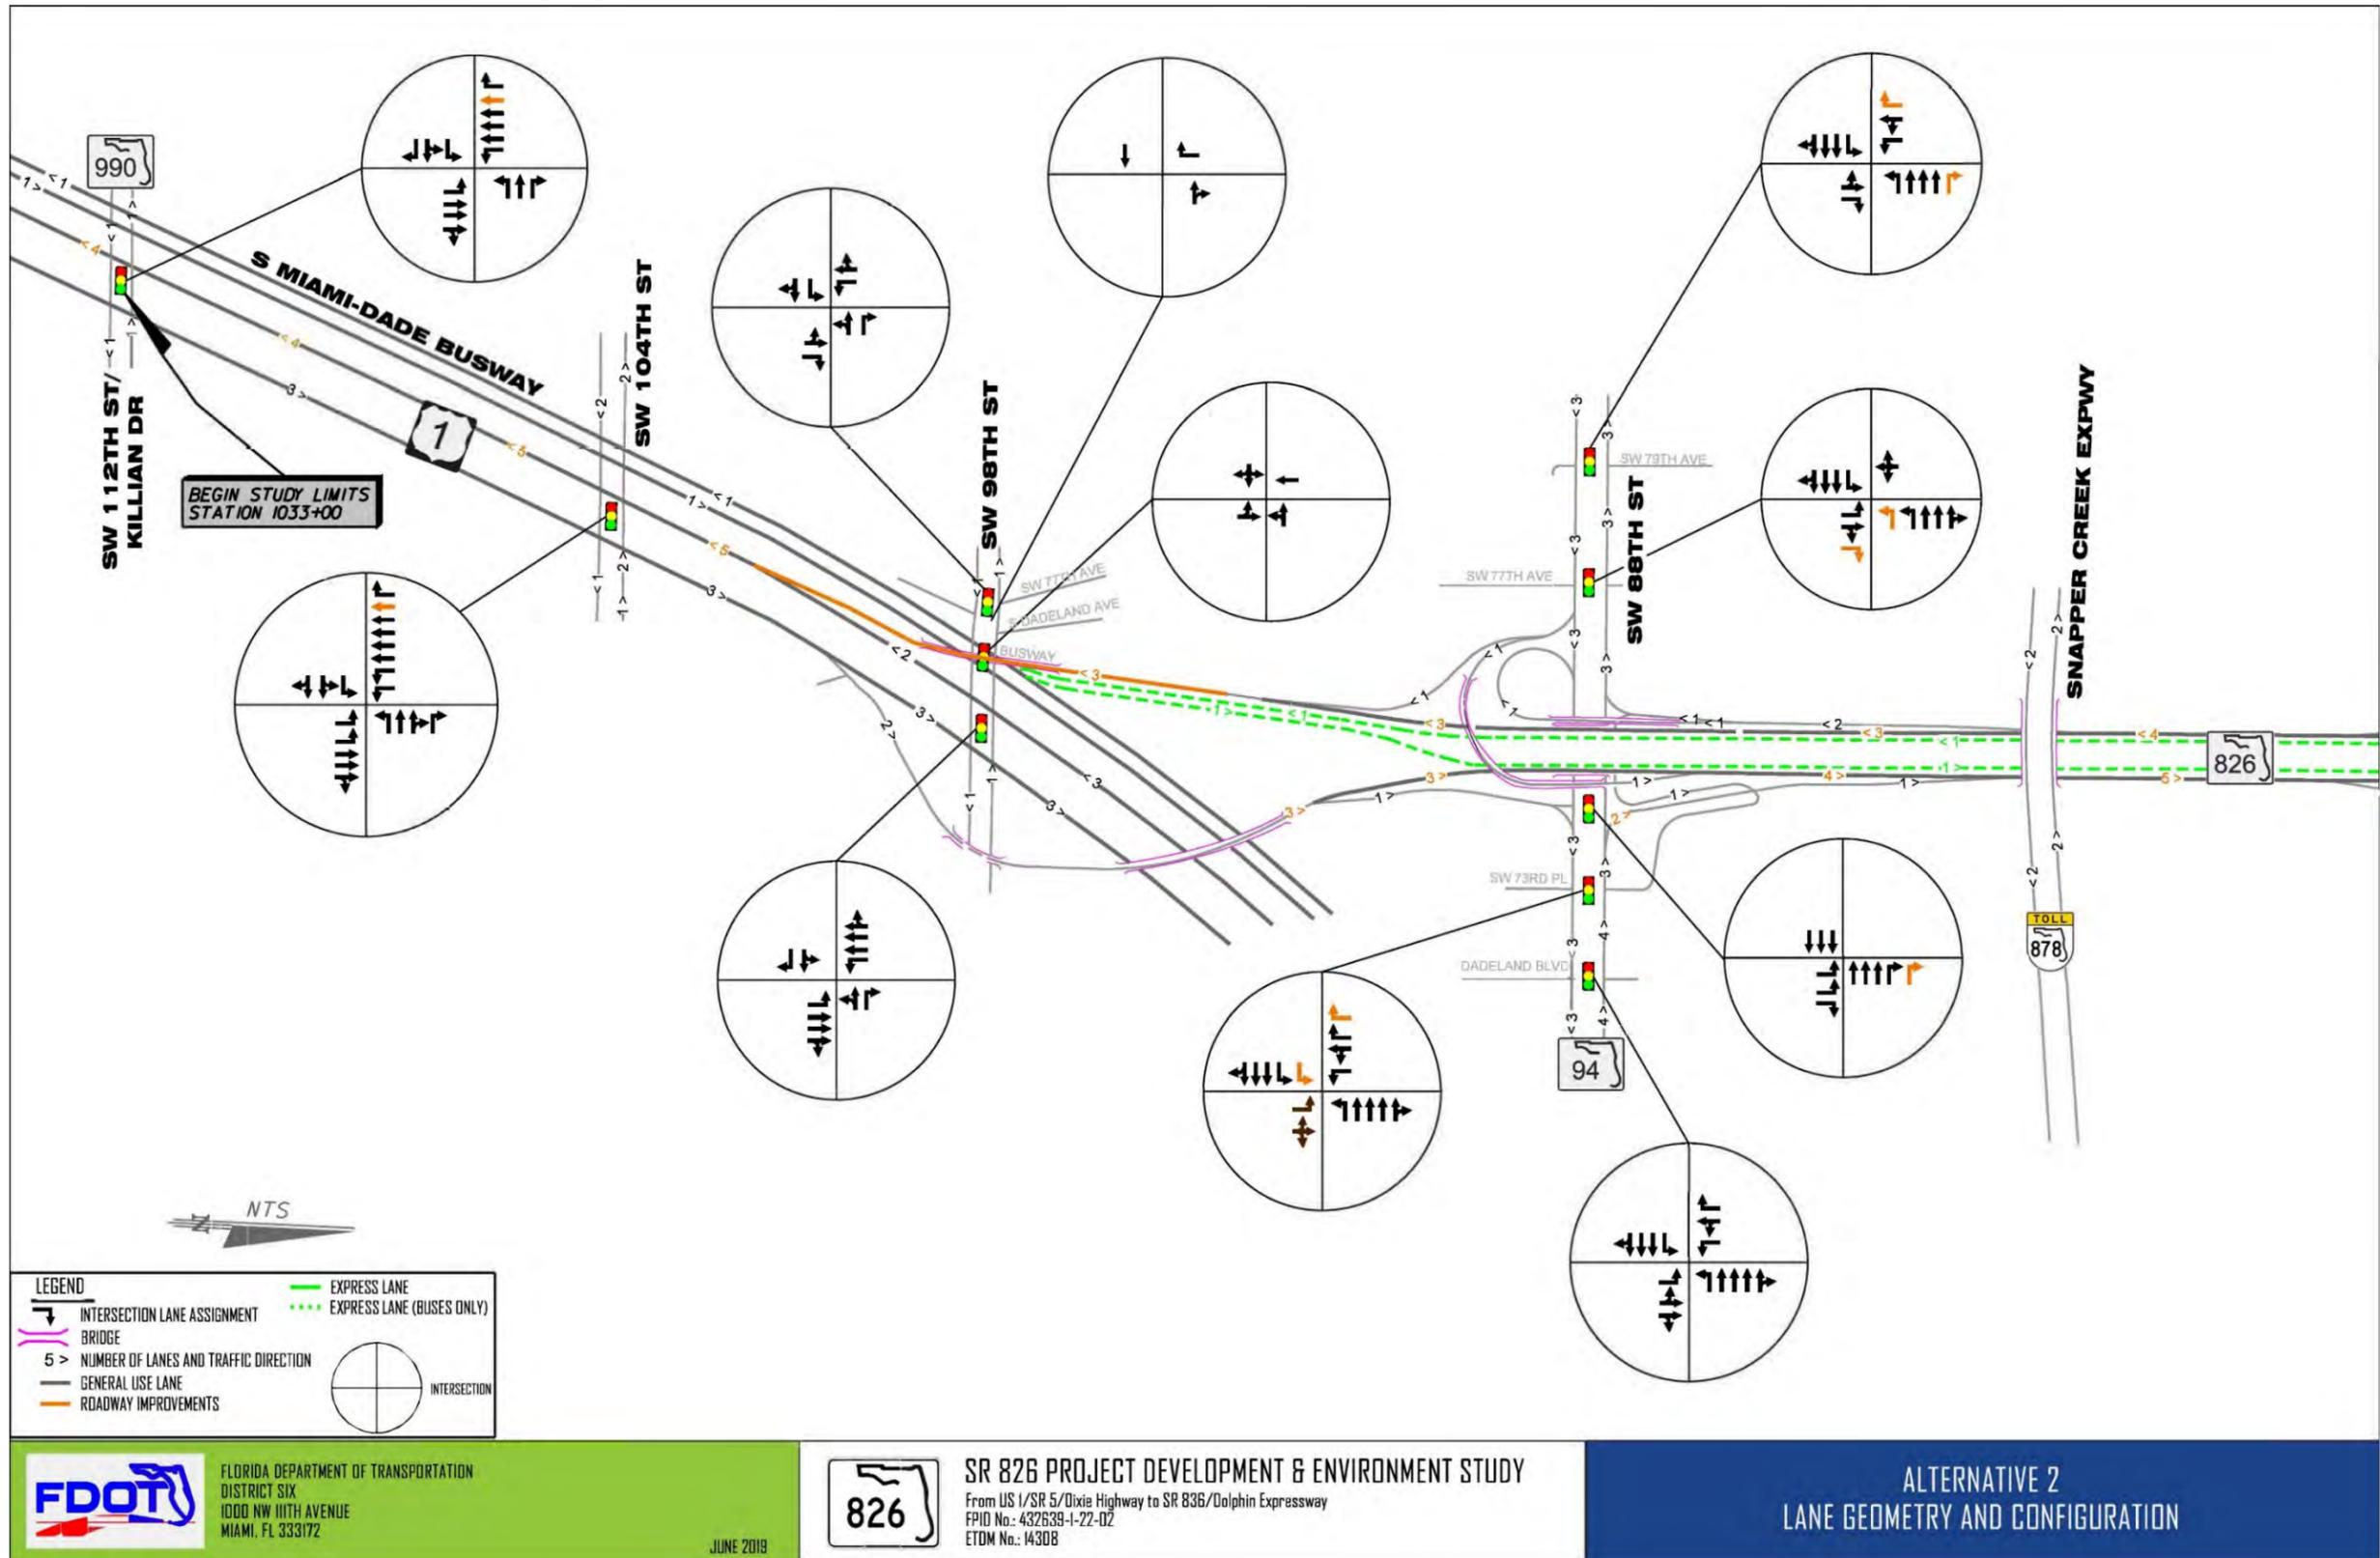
Preferred Alternative Lane Geometry and Configuration from SW 112th Street/Killian Street to North of SR 878/Snapper Creek Expressway
